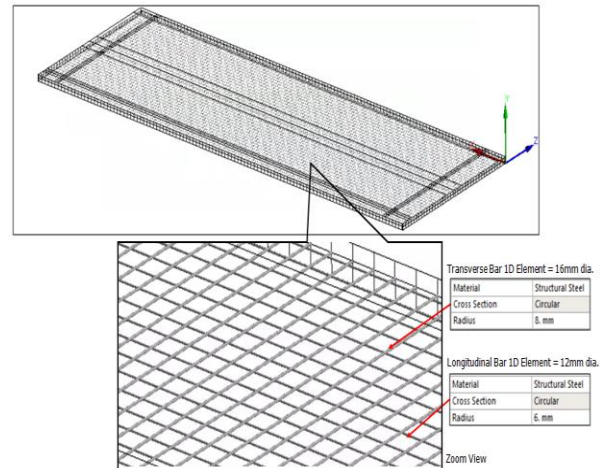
Reinforcement bar Mesh Model Details 200 mm thick Continuous Reinforced Concrete Pavement Road
